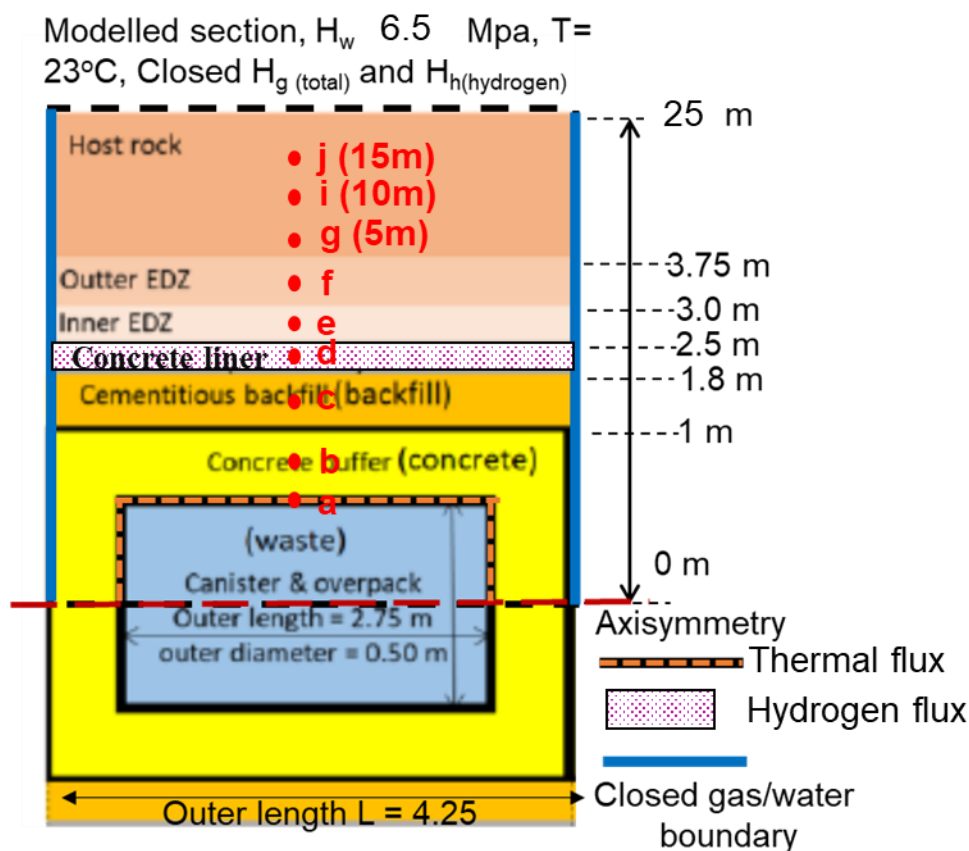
2D tunnel section from the disposal Zone B (EURAD: Milestone 61 2021).
